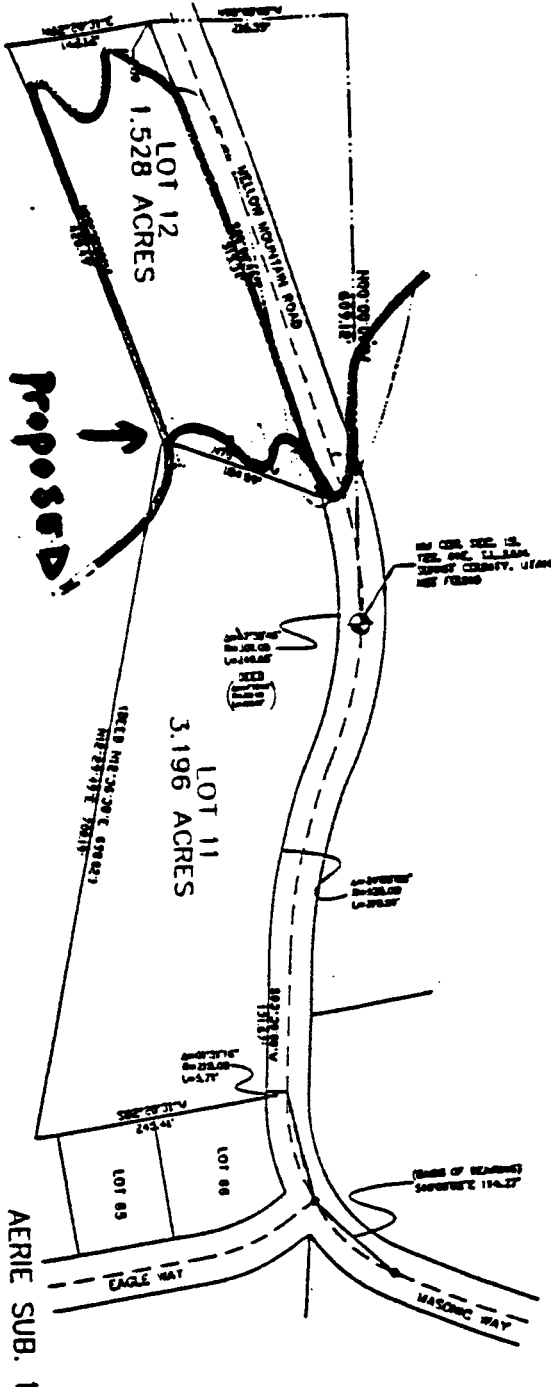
EXHIBIT A - PLAT AMENDMENT & PROPOSED TRAIL CONNECTION
